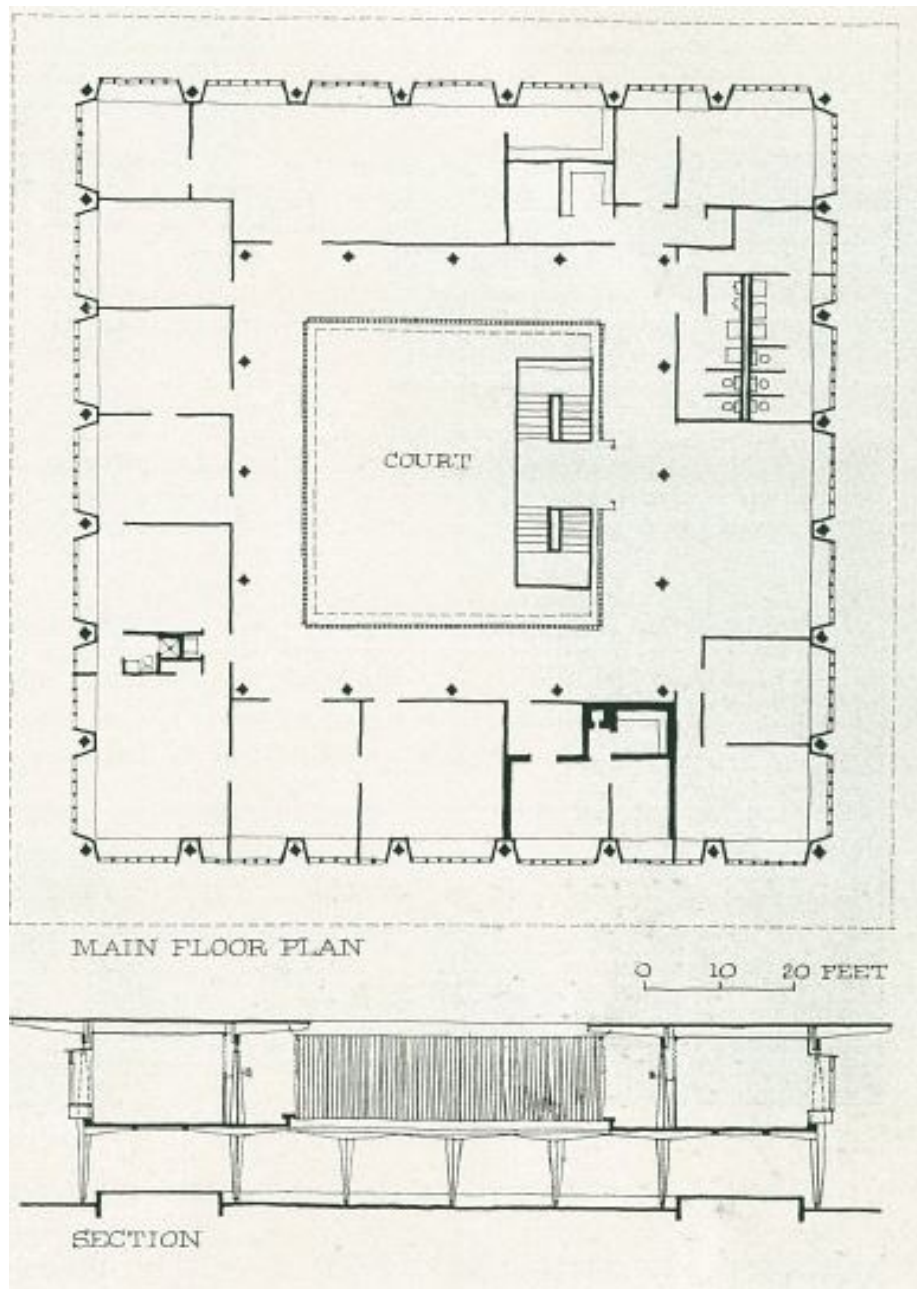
United States Embassy Plan and Section²⁰⁶
